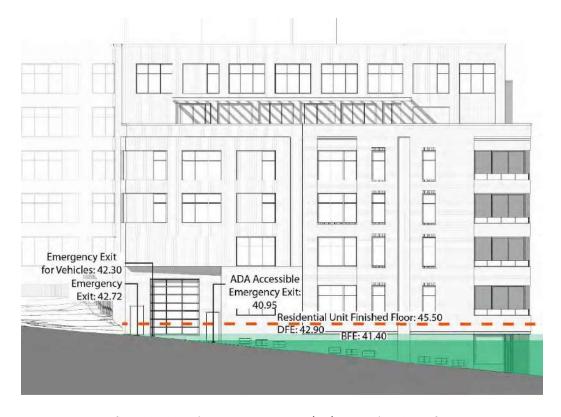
Elevation view of west building (per CBP Architects 6/06/24 plans) with key flood and building elevations
